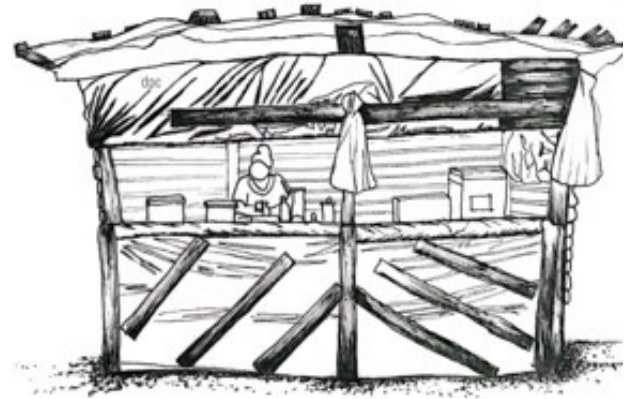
Eastern Elevation of the shelter. (Authors Own)
